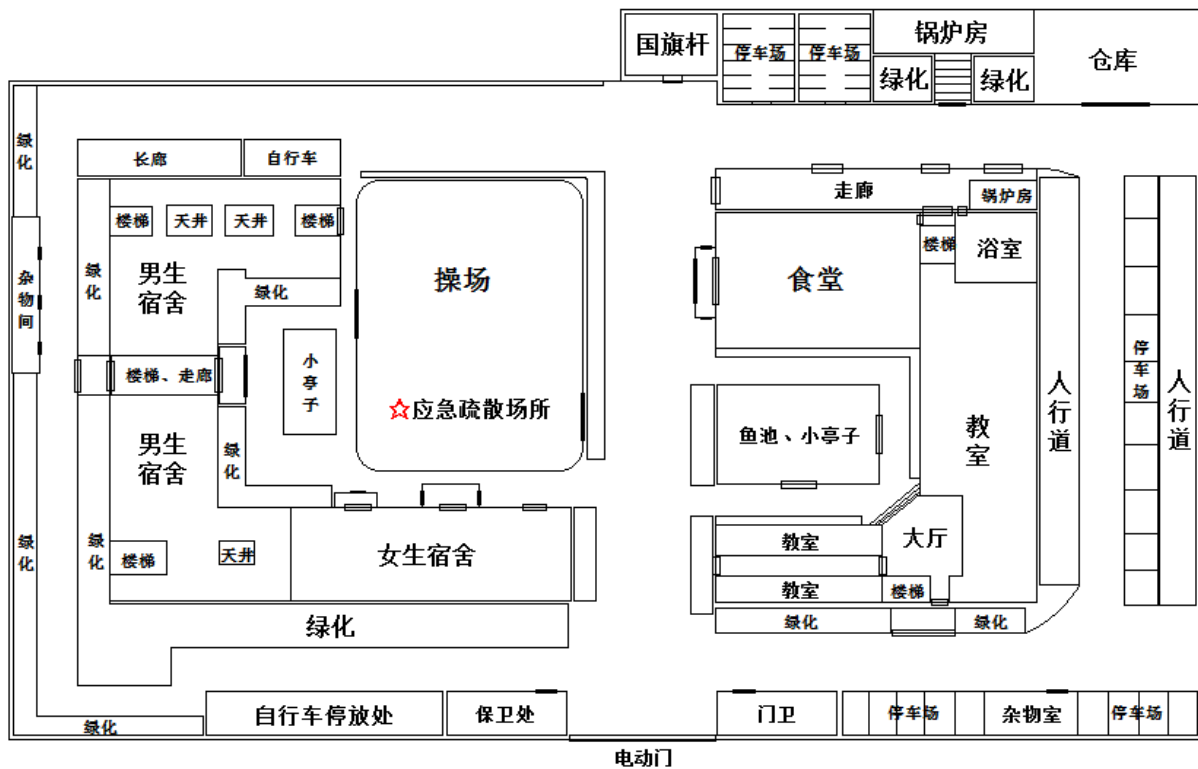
Detail floor plan of Campus of Kangzhuang, Beijing Institute of Petrochemical Technology
